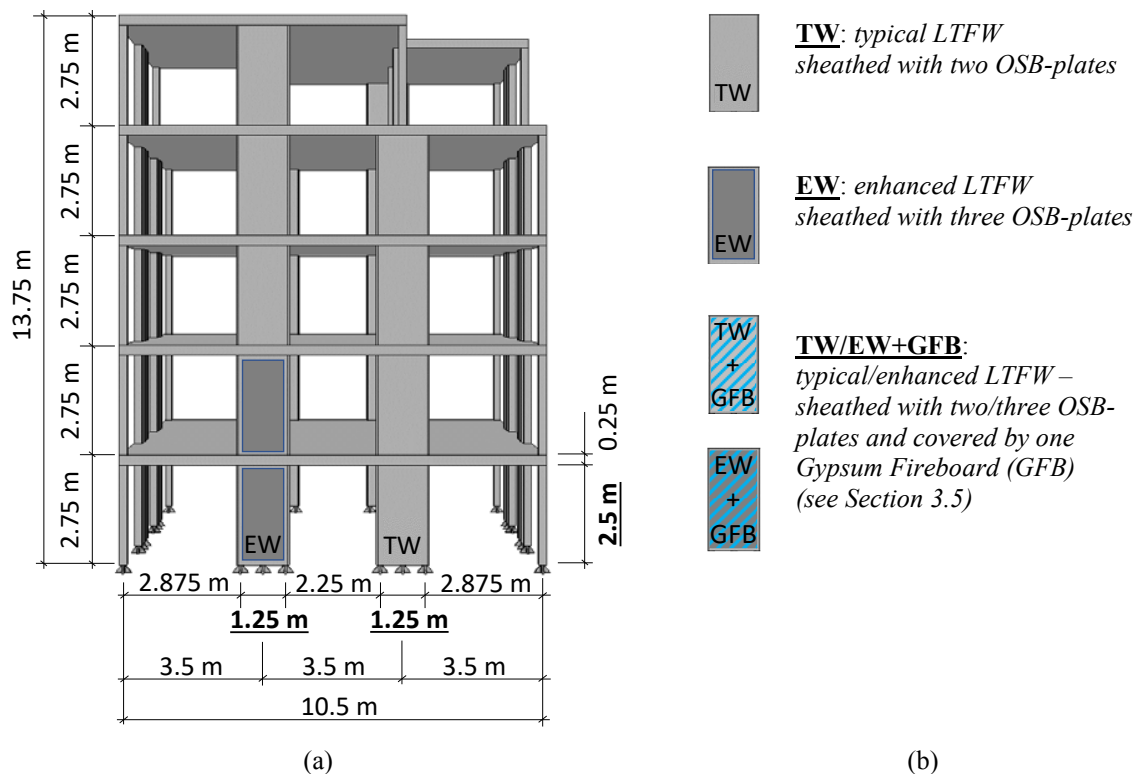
5-floor case study building with perimeter lateral load resisting timber structure: (a) overall dimensions and position of the walls; (b) types of light timber frame walls
